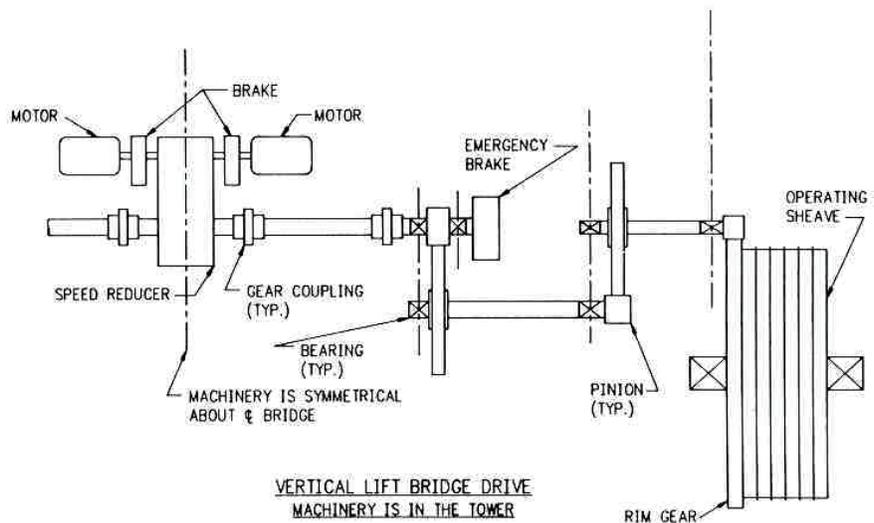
Vertical Lift Bridge Machinery is Located on the Towers, and the Rim Gears (and Operating Sheaves) are Rotated to Raise and Lower the Bridge
